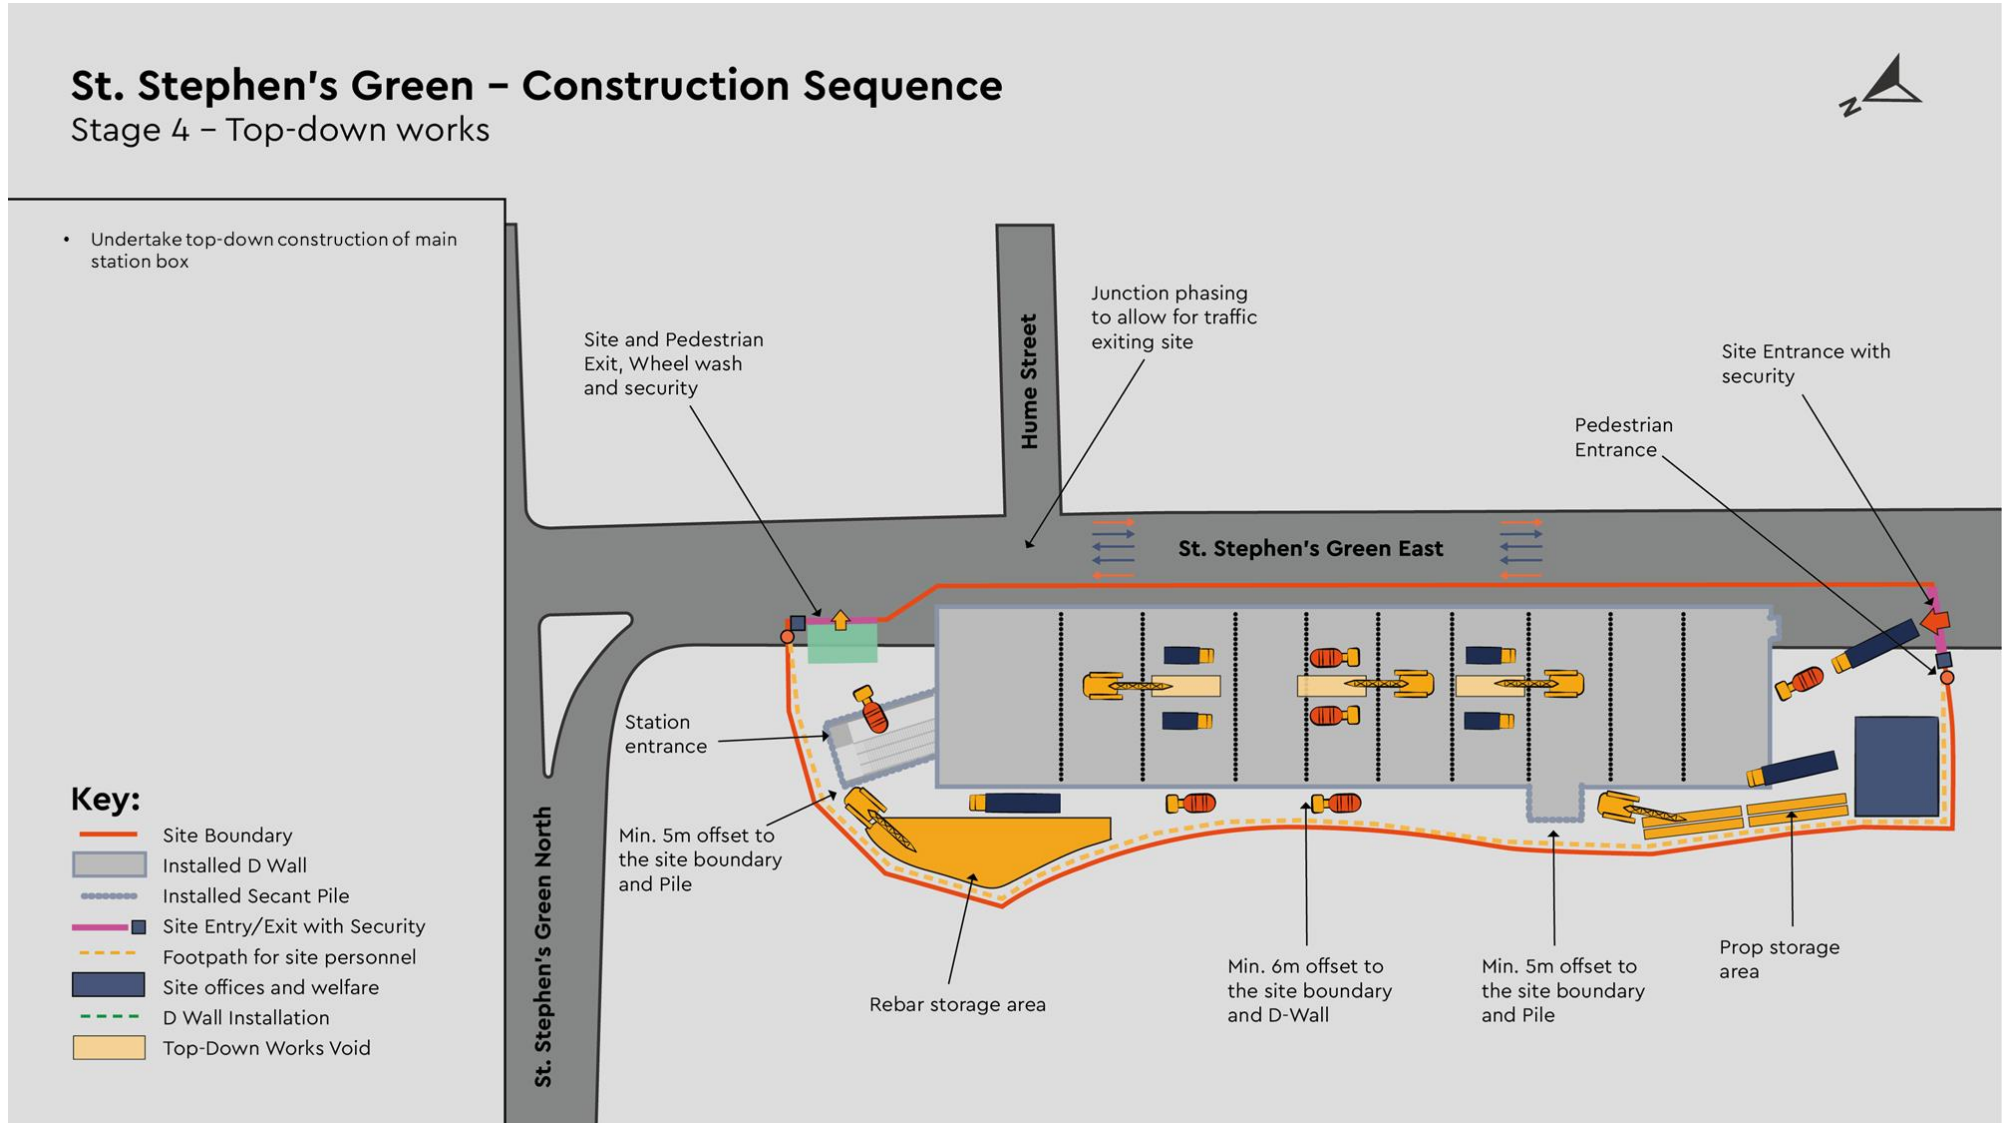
St Stephen's Green Stage 4 – Top-down works
